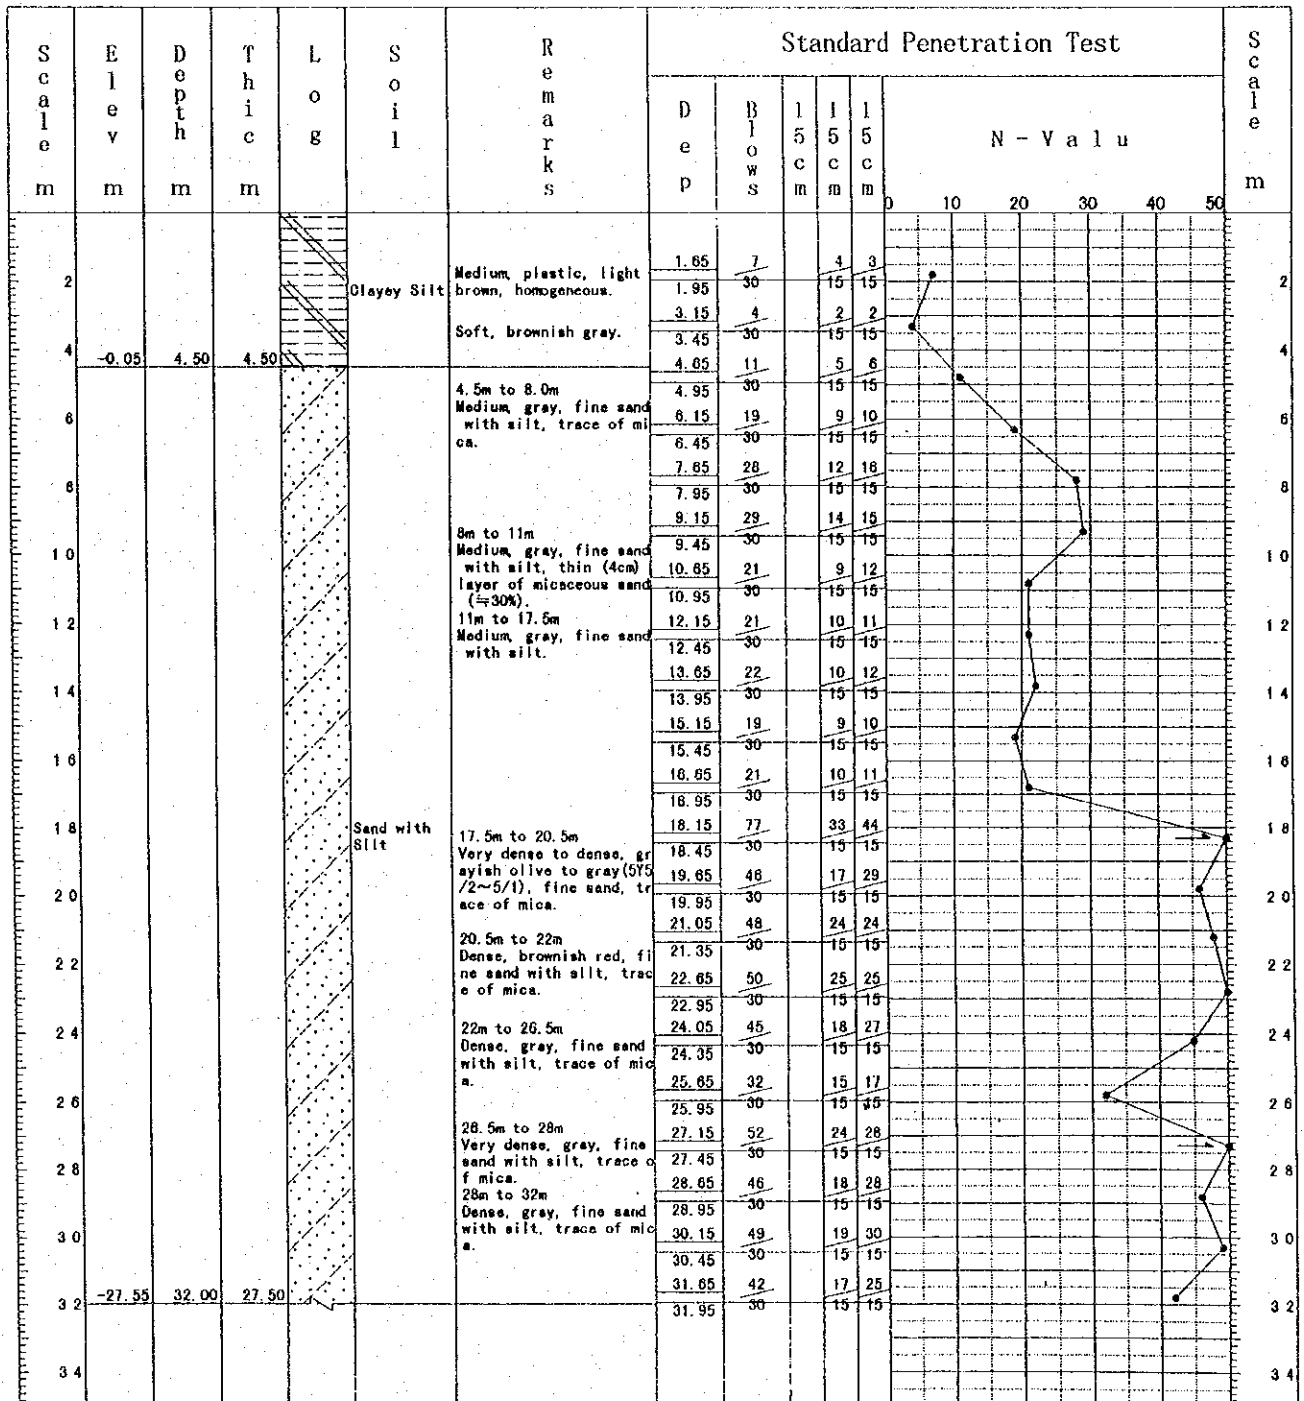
Drilling Log Map at Bhairab Bridge Site
